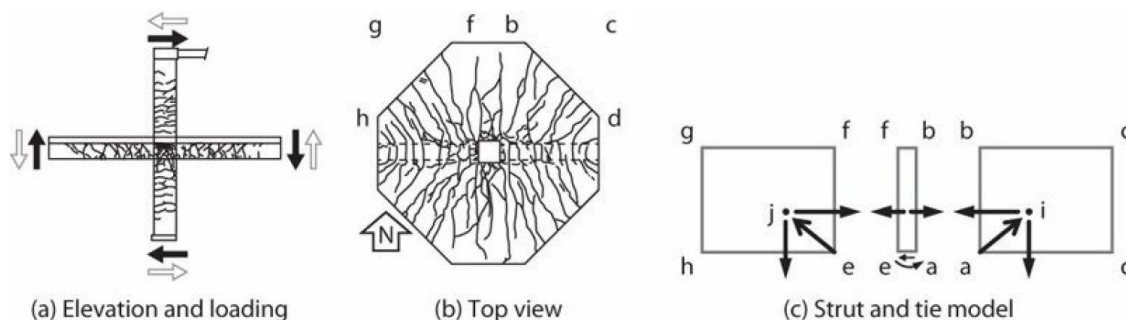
Actions on an isolated beam-slab-column connection under lateral loading. Test results for test specimen J1. (After Kurose et al., 1988, courtesy of American Concrete Institute.)
